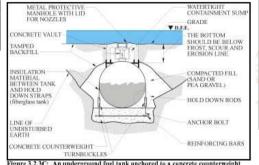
C: An underground fuel tank anchored to a concrete counterweight Courtesy of Adamson Global Technology Cop.
